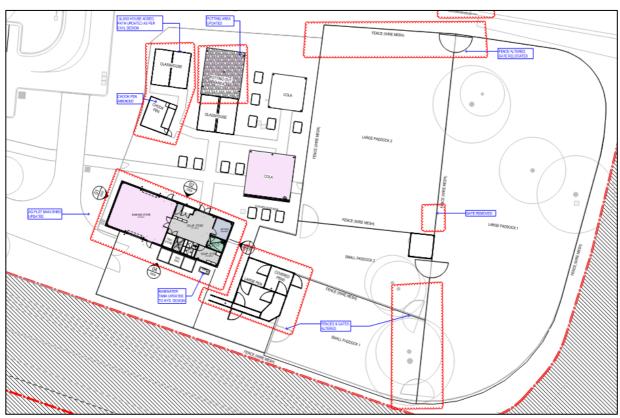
PROPOSED MAIN SHED EXPANSION AND PENS
